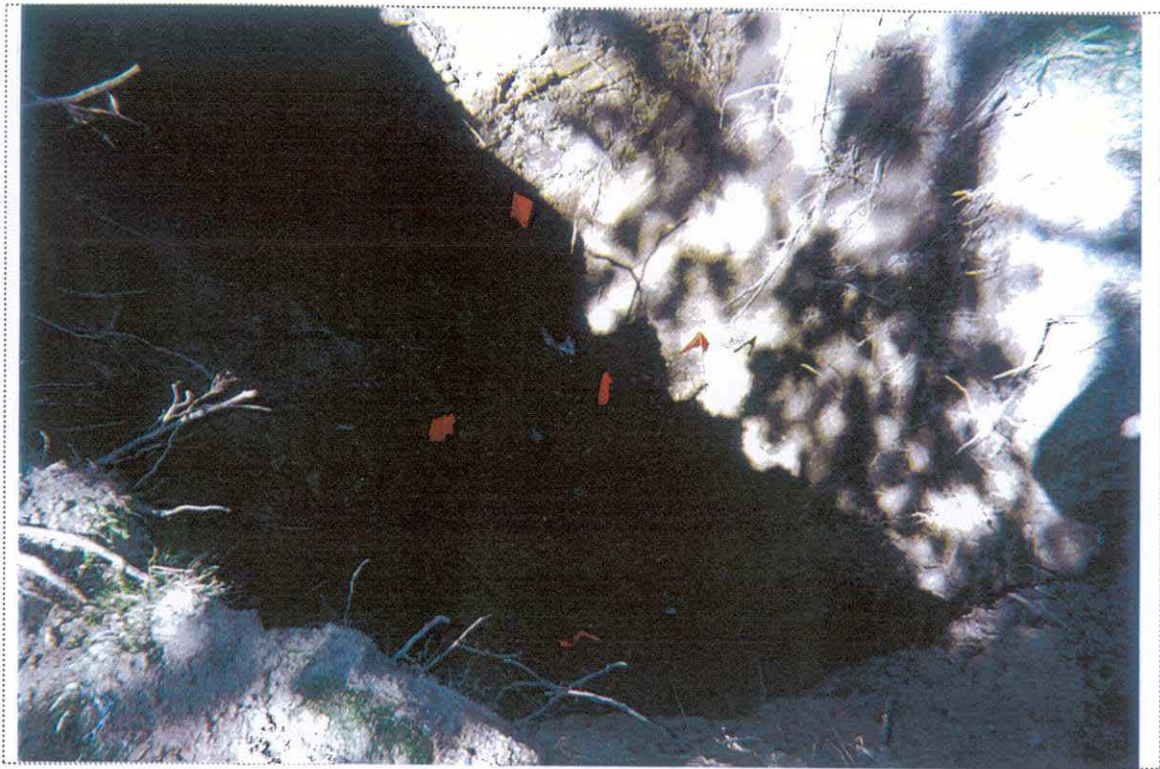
View of the sampling locations in the UST-9059 excavation (looking northeast).
